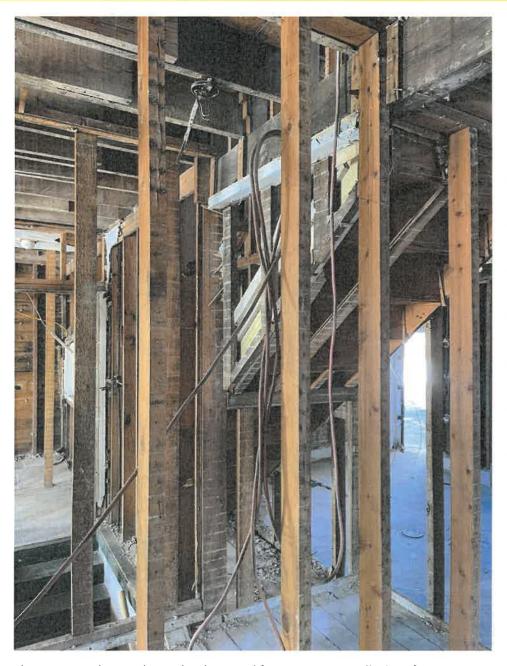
North Wing (First Floor) – Wood framing at east wall. Floor framing unsupported and timber beam has no apparent vertical support.
